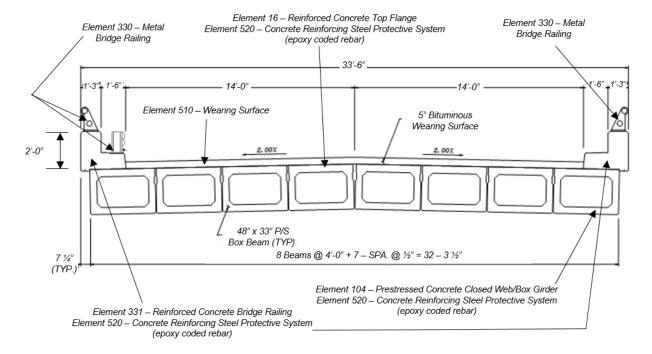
Typical Section of P/S Non-Composite Adjacent Box Beam Bridge (looking ahead)
